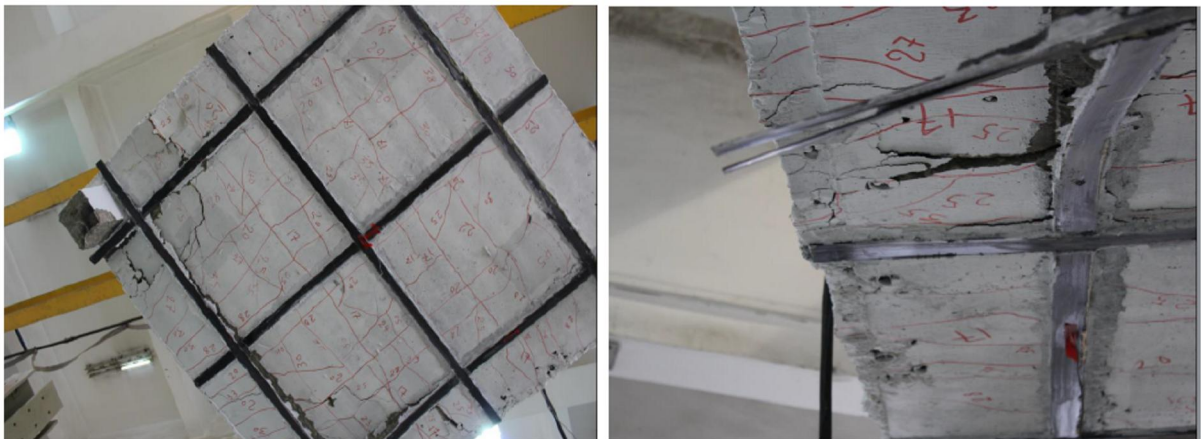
Concrete Crushing, Debonding and Rupture of FRP for BS2.
